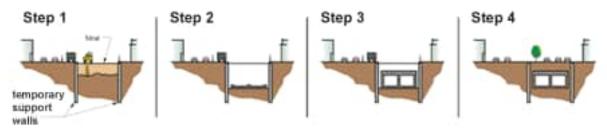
Bottom up Cut and Cover Construction [P-74]
